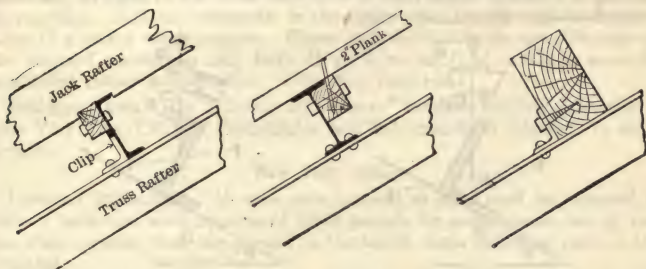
Purlin-connections. Steel Sections with Wooden Nailing-strips
